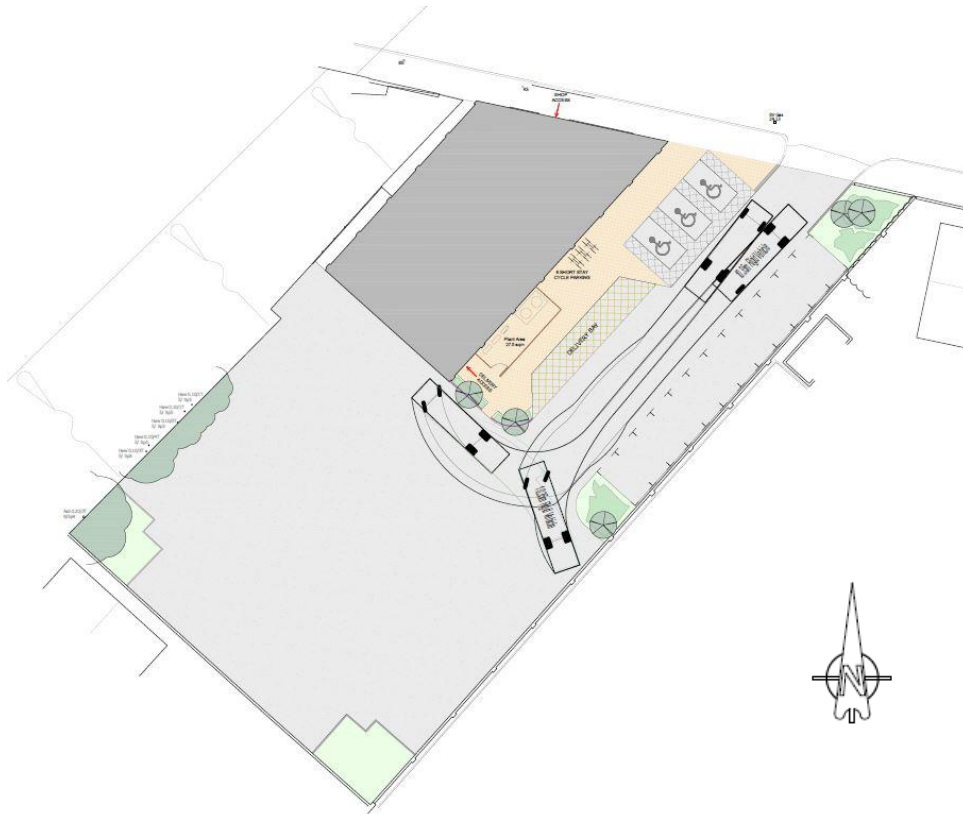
Proposed Site Plan showing car park, vehicle access and goods delivery route on site. NTS
